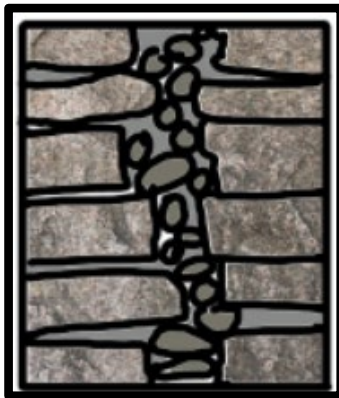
Double leaf masonry, connection between leaves with interlocking
